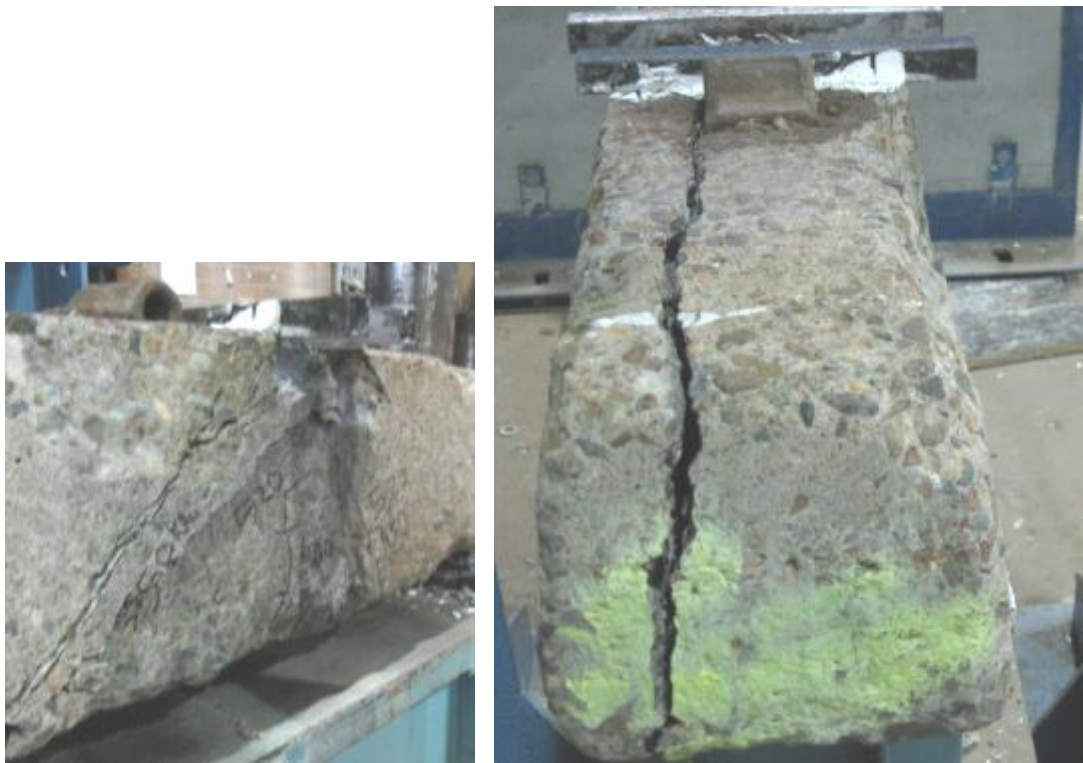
Failure modes of sleepers subjected to the rail seat positive moment test (a) crushing of concrete in compression, (b) end splitting failure.
